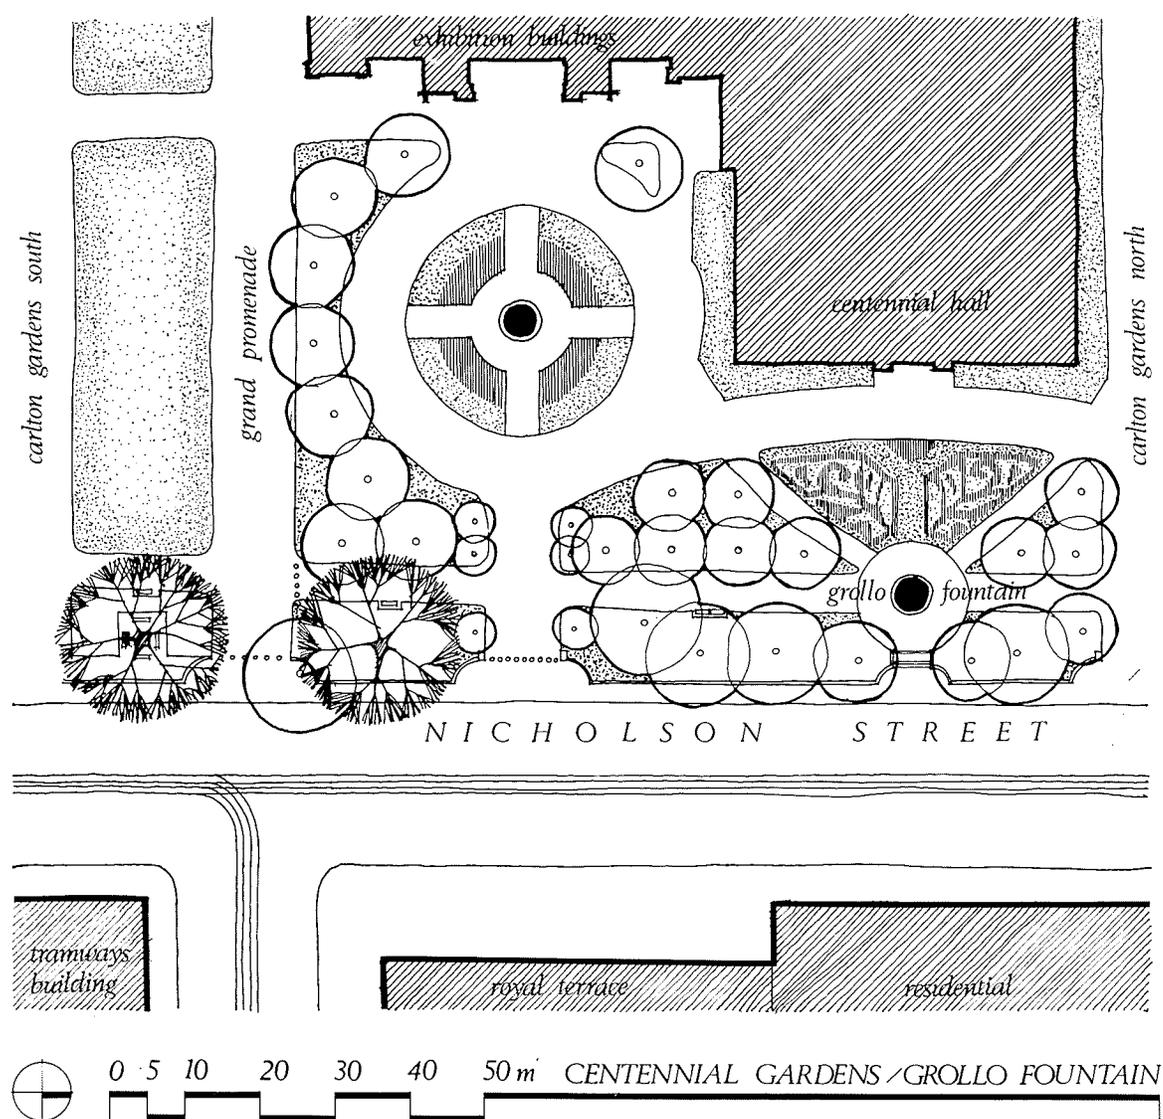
Centennial Gardens/Grollo Fountain -- Site Plan.
